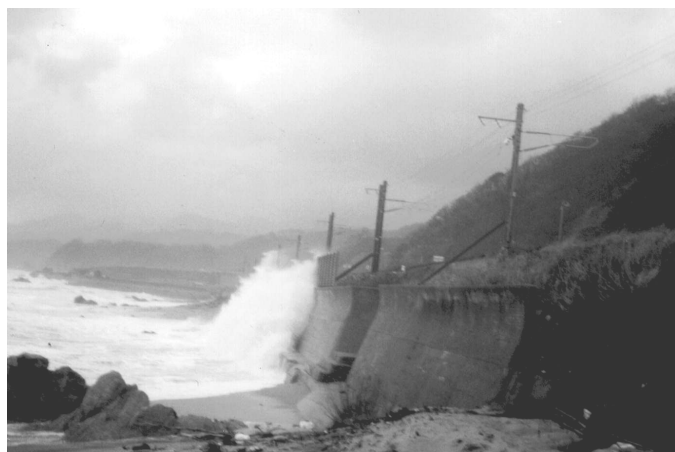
The waves condition of the collapse site before 2 hours of the collapse occurrence
